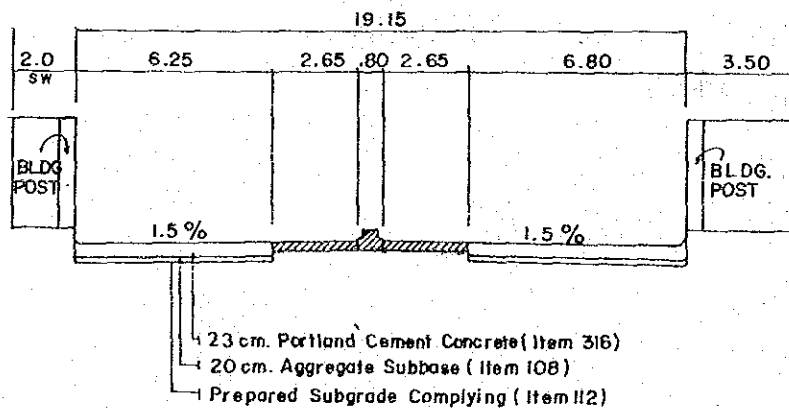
PROPOSED IMPROVEMENT: URBAN SECTION OF SAN JOSE CITY
